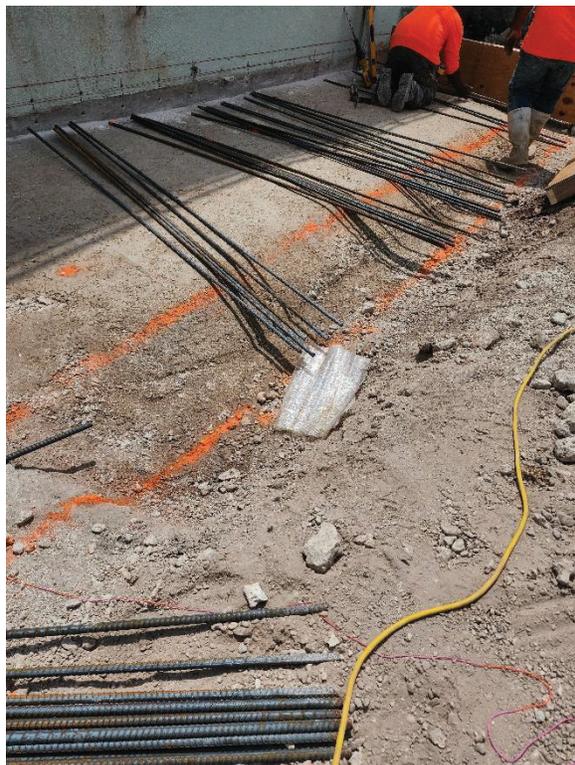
and 7. Embedment of rebar in existing wall of the plant pump station
